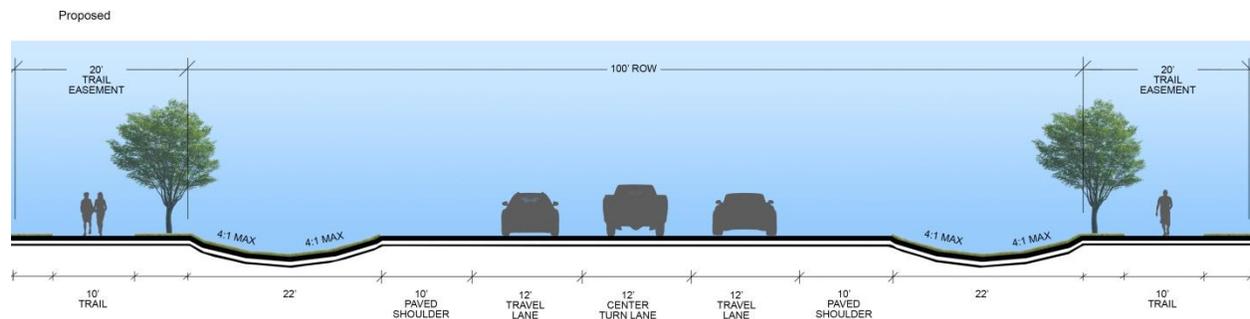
Typical Section of Principal Rural Arterial Roadways
